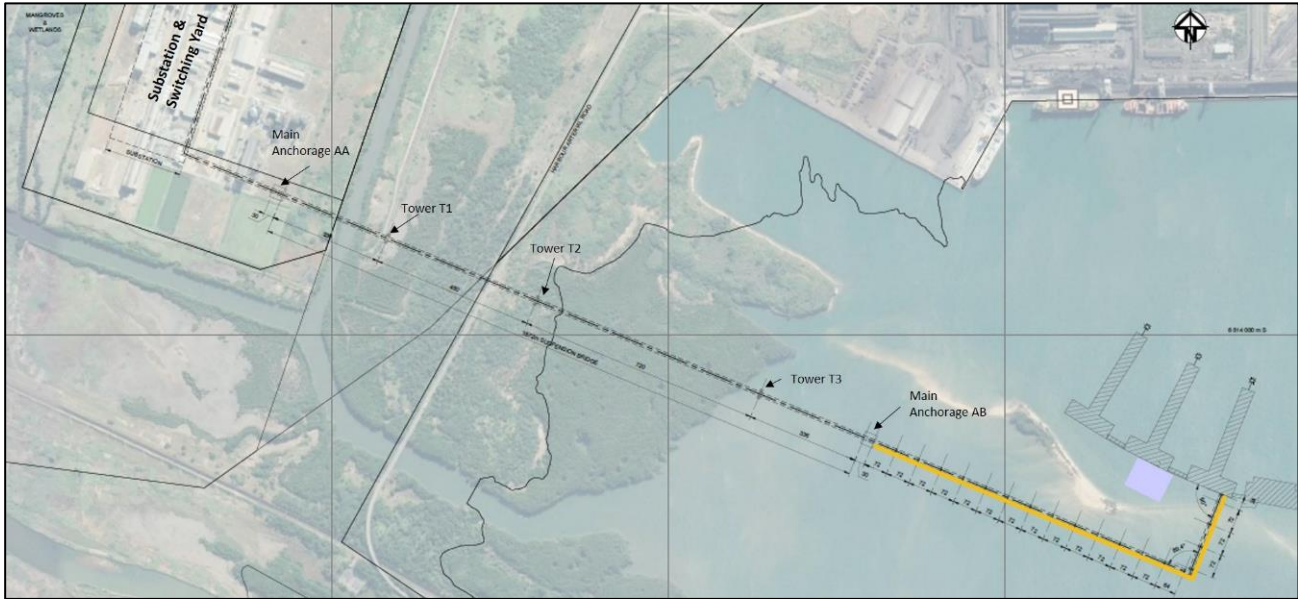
Temporary steel piled working platform and causeway (refer to Appendix 4 for detailed drawings)
